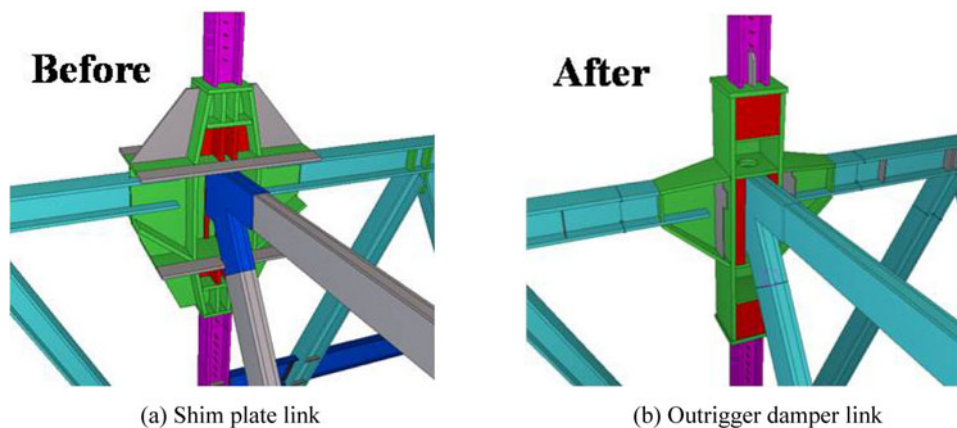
Design change at the outrigger to perimeter column/belt truss joints.
